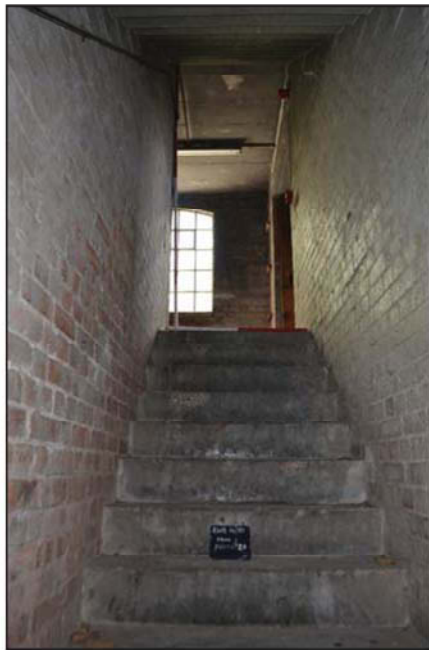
View up the stairs, looking northeast, Scales: 2m and 1m.
